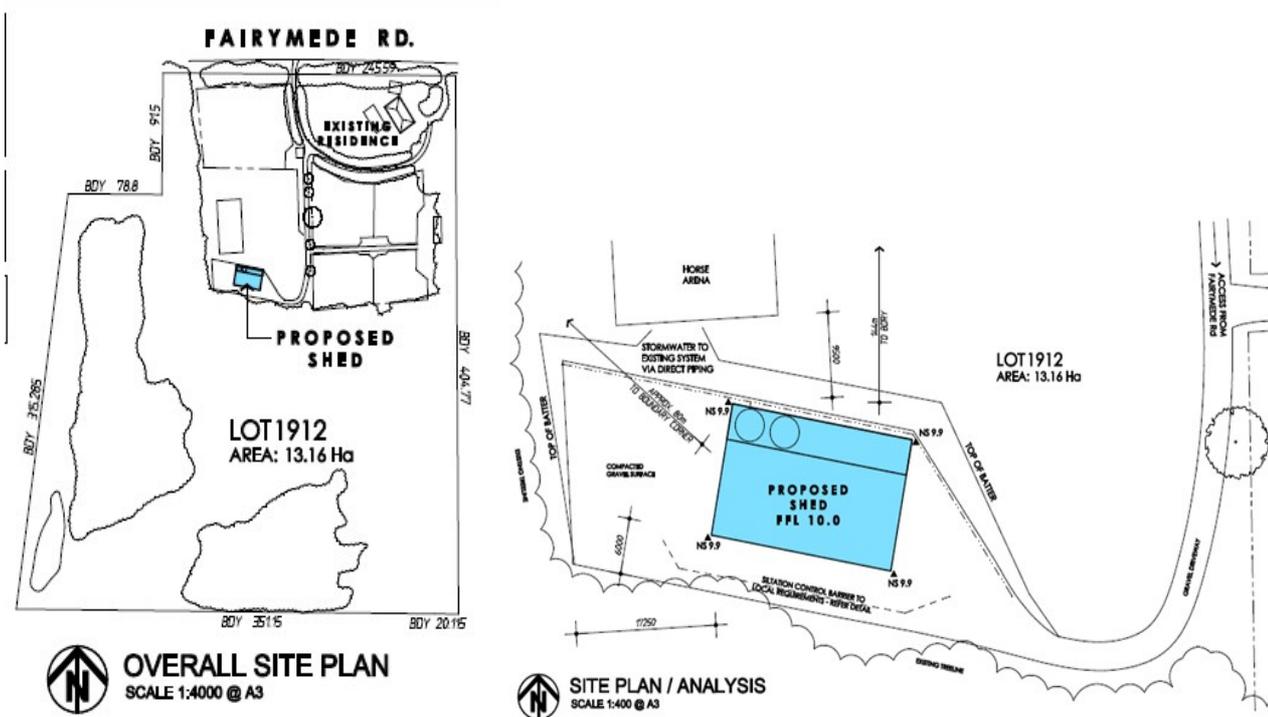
Extract of Site Plan for proposed Shed (Source: CEO)
